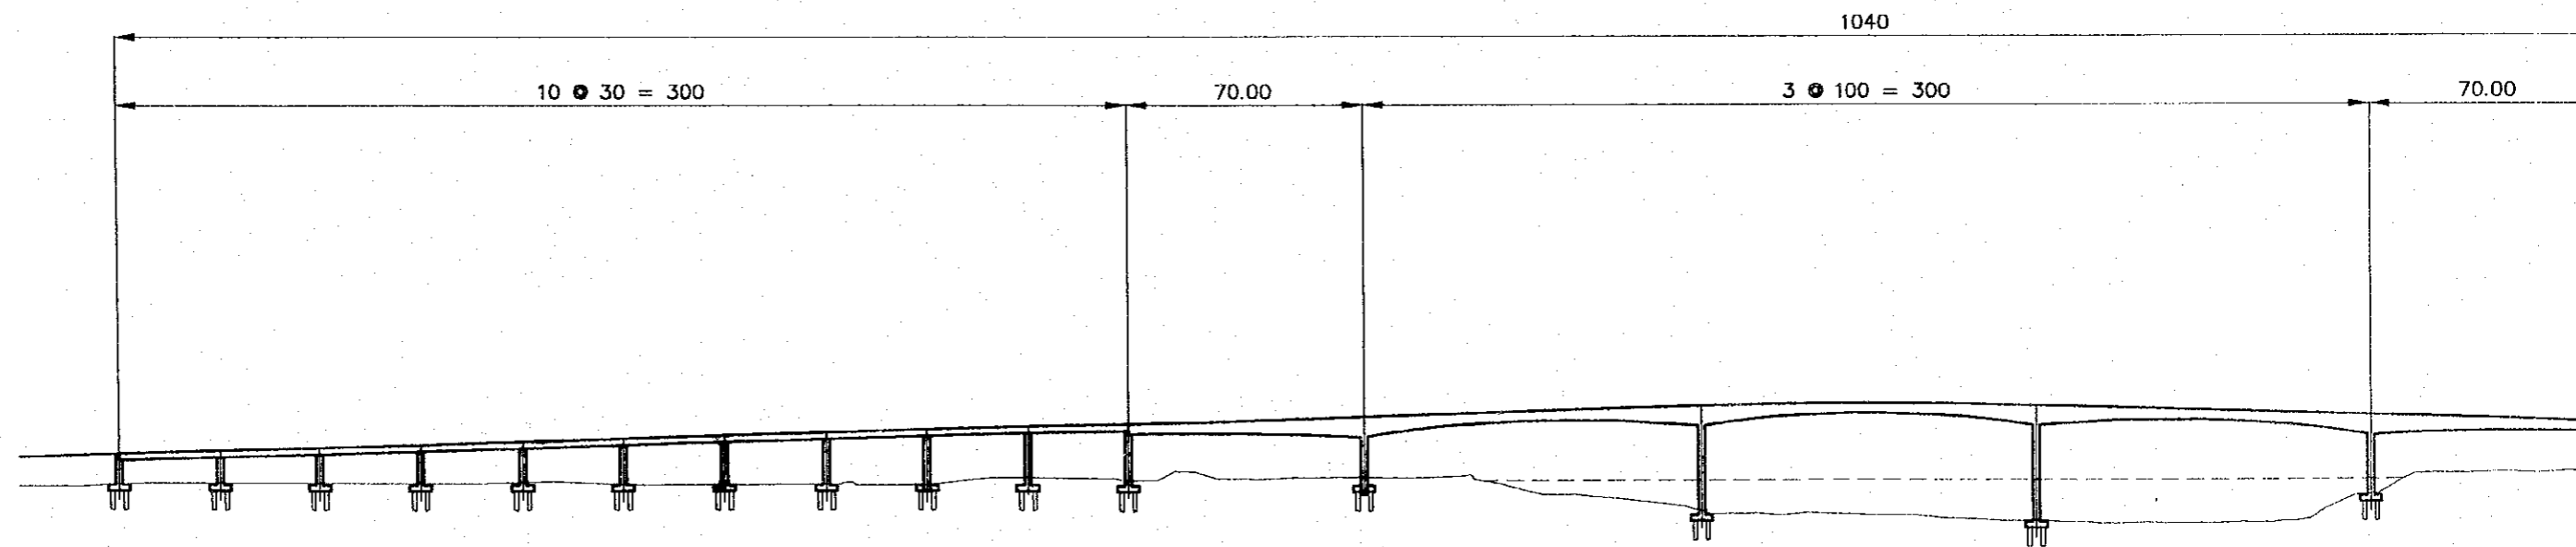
Recommended Type for Bhairab Bridge
